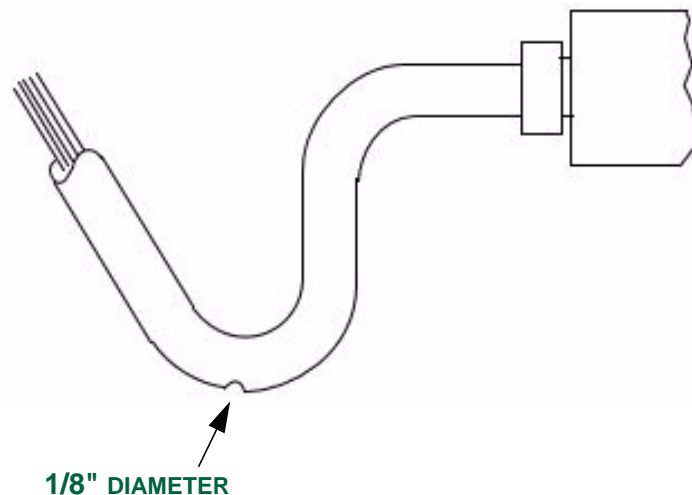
DRAINAGE HOLE AT BOTTOM OF DRIP LOOP IN METALLIC CONDUIT
